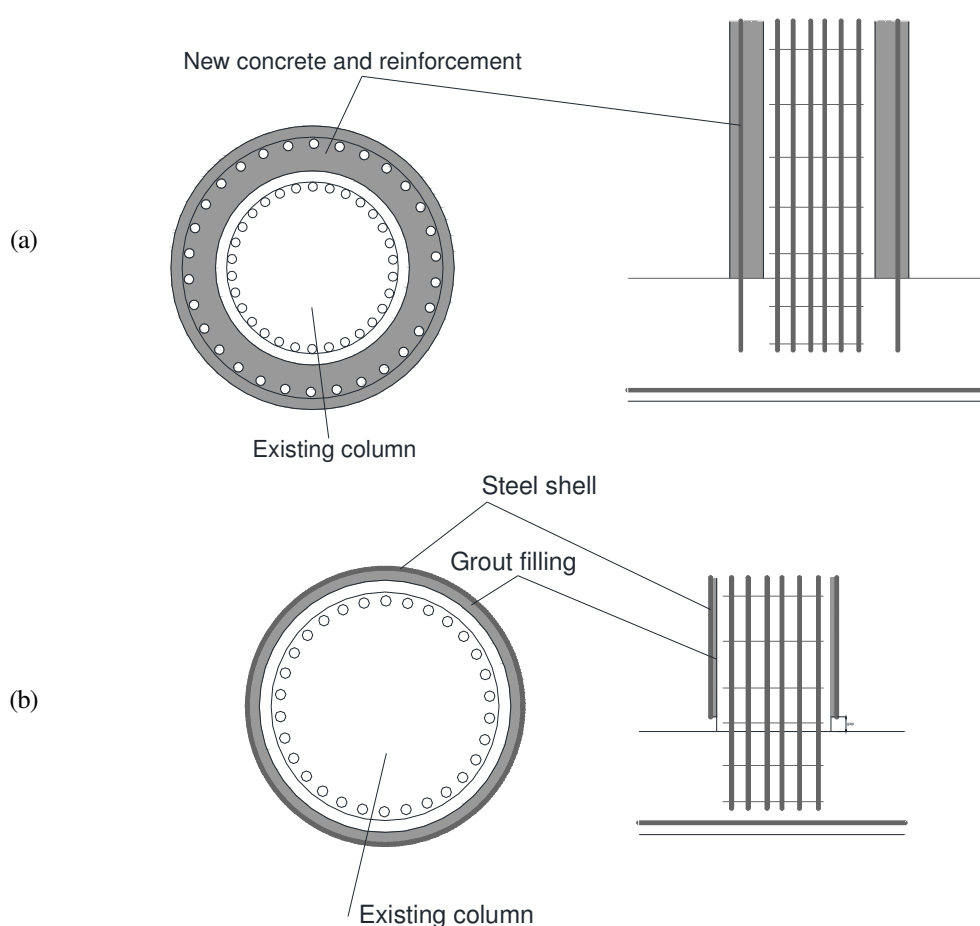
(a) Concrete jacketing and (b) Steel jacketing (encasing) of a circular section column (Monti, 2003).
